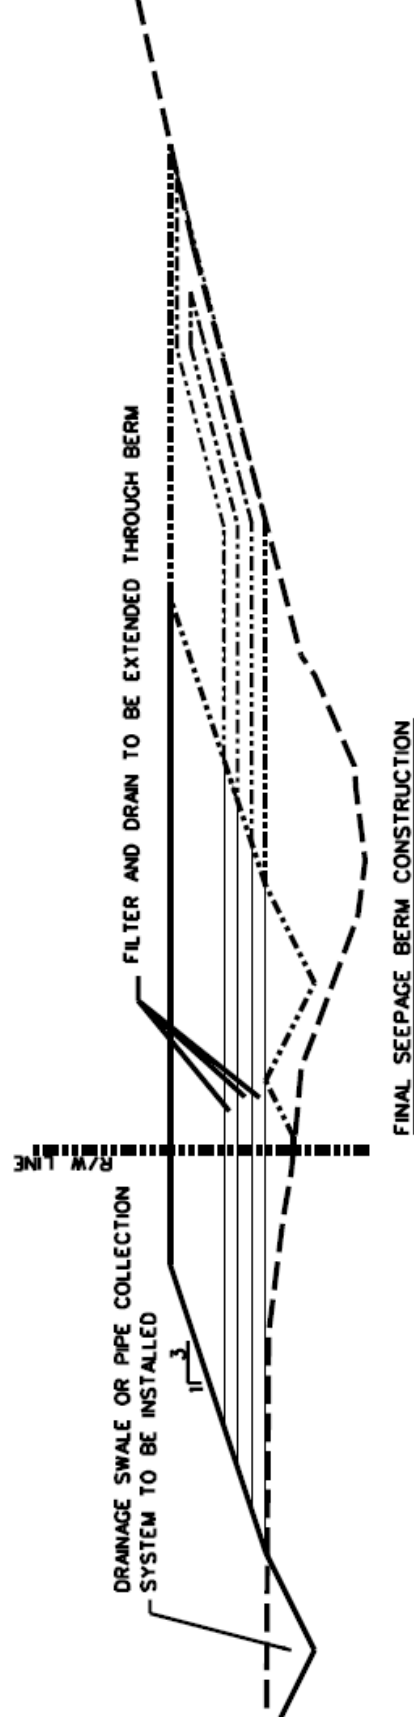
TYPICAL CROSS SECTION OF THE FULL SEEPAGE BERM
